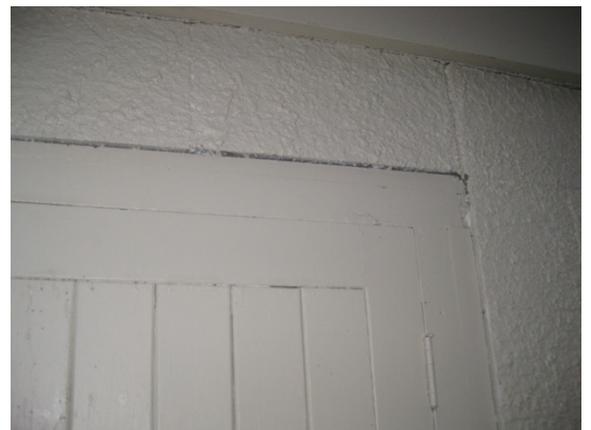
Gaps opening up between timber elements in the doorframe on the north side.
